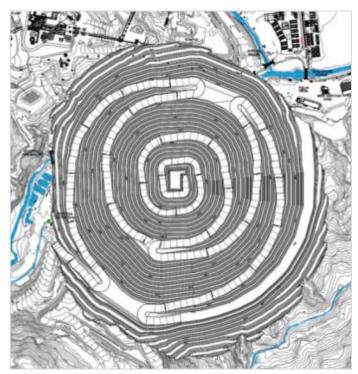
Pre-Study Stage Six (Final) Pit Design
